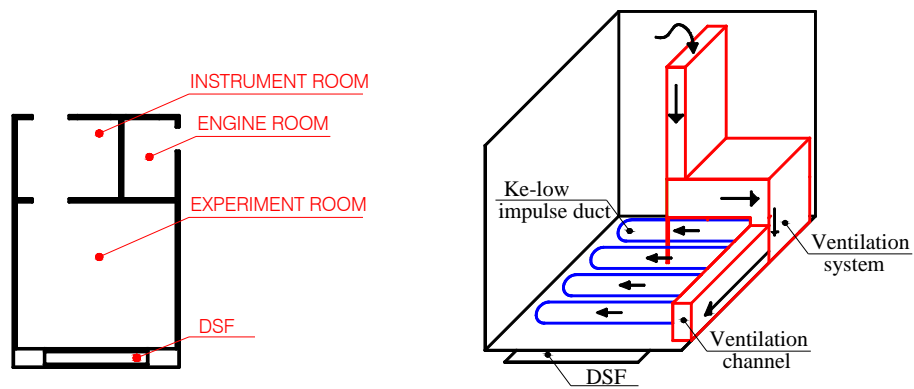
Plan of 'the Cube' (left), schema of the ventilation system in the experiment room (right).
